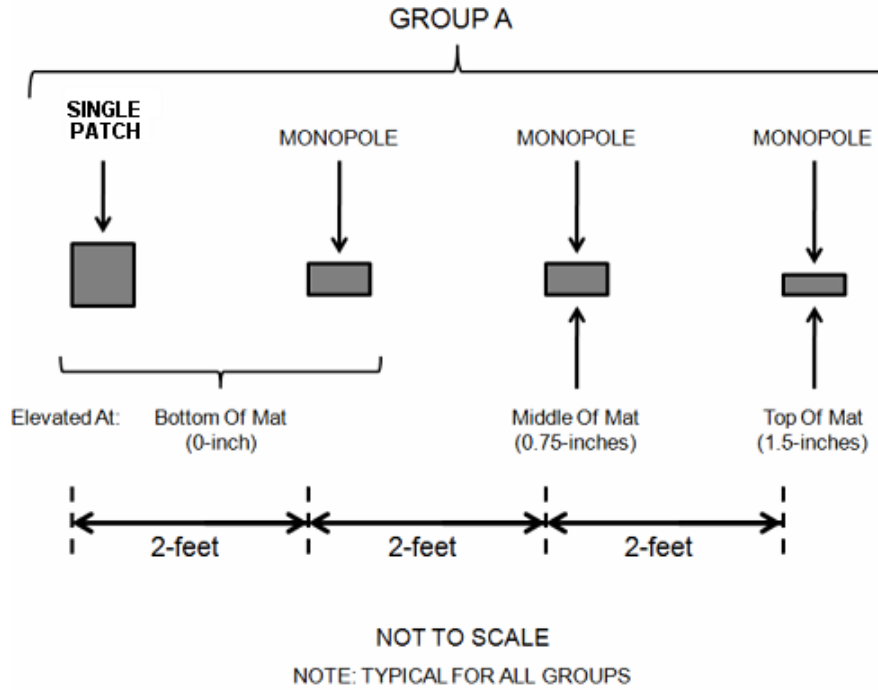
Drawing. Detailed plan view of a single group of SAW RFID tags.
